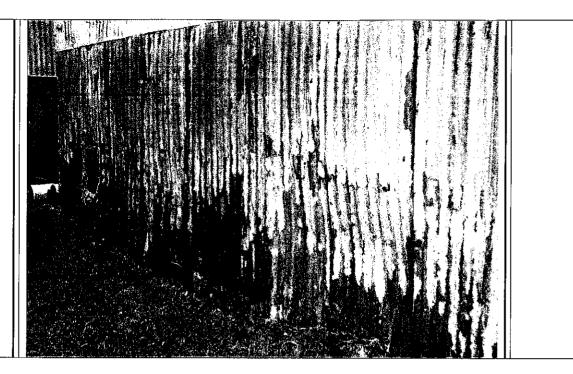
04/27/05 - Carpenter's Shop (Building #16): Water damage at foundation wall
